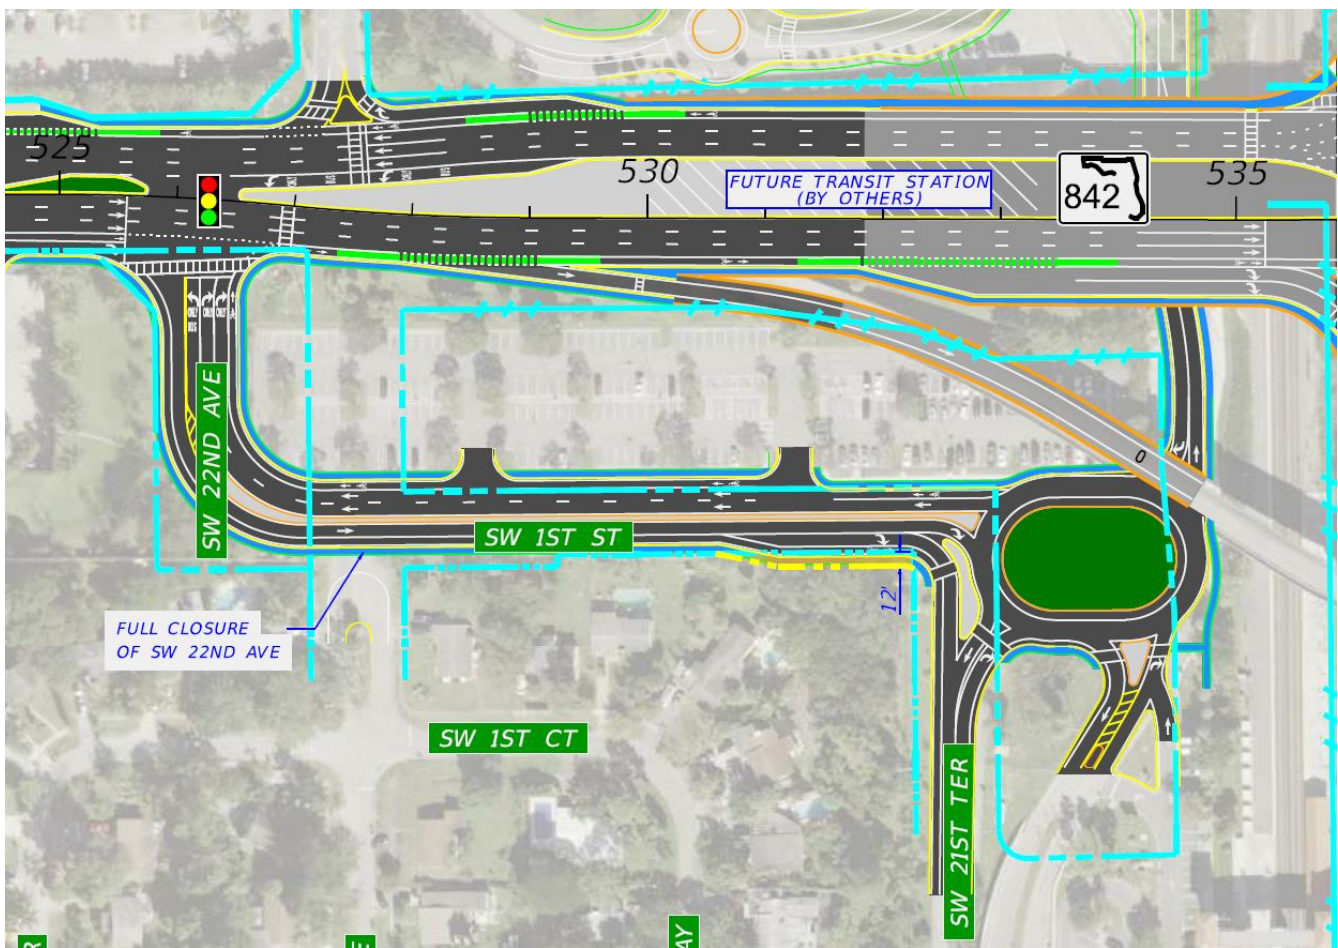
| SW 1<sup>st</sup> Street Alternative 3 – Double Roundabout
